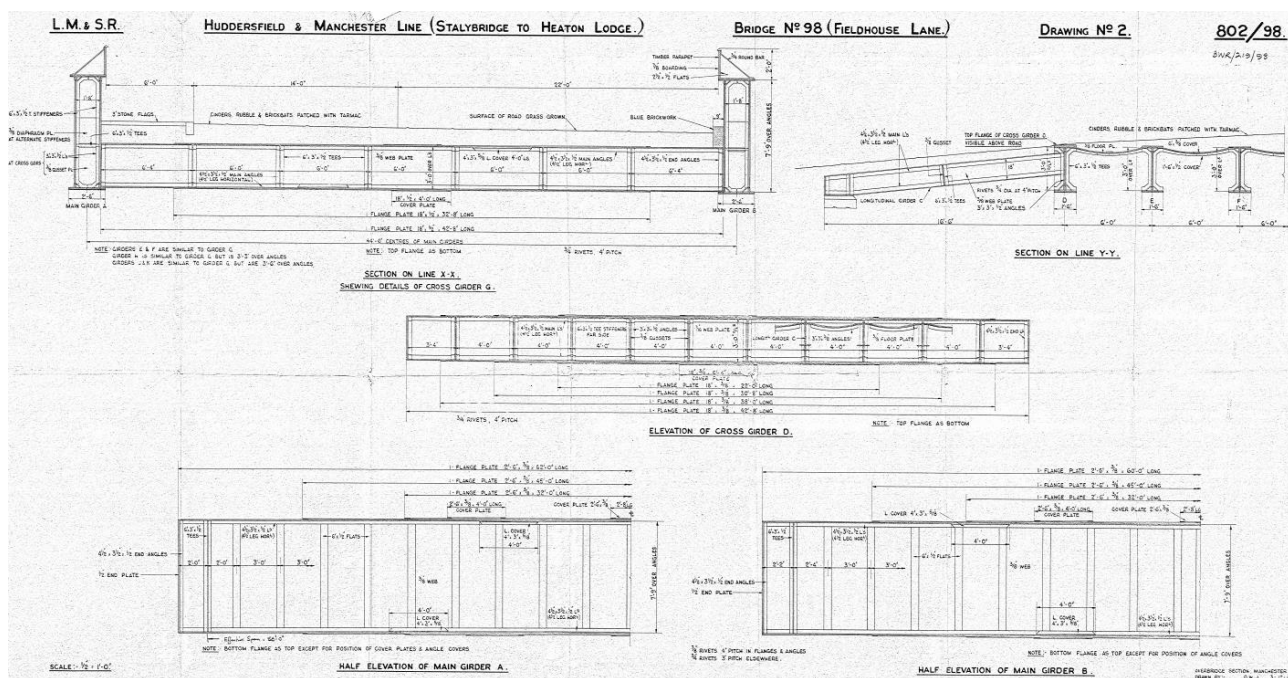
Elevations and sections of the deck of Fieldhouse Overbridge (MVL3/98), 1942 (Network Rail NRG Archives, DMFP00117423).
